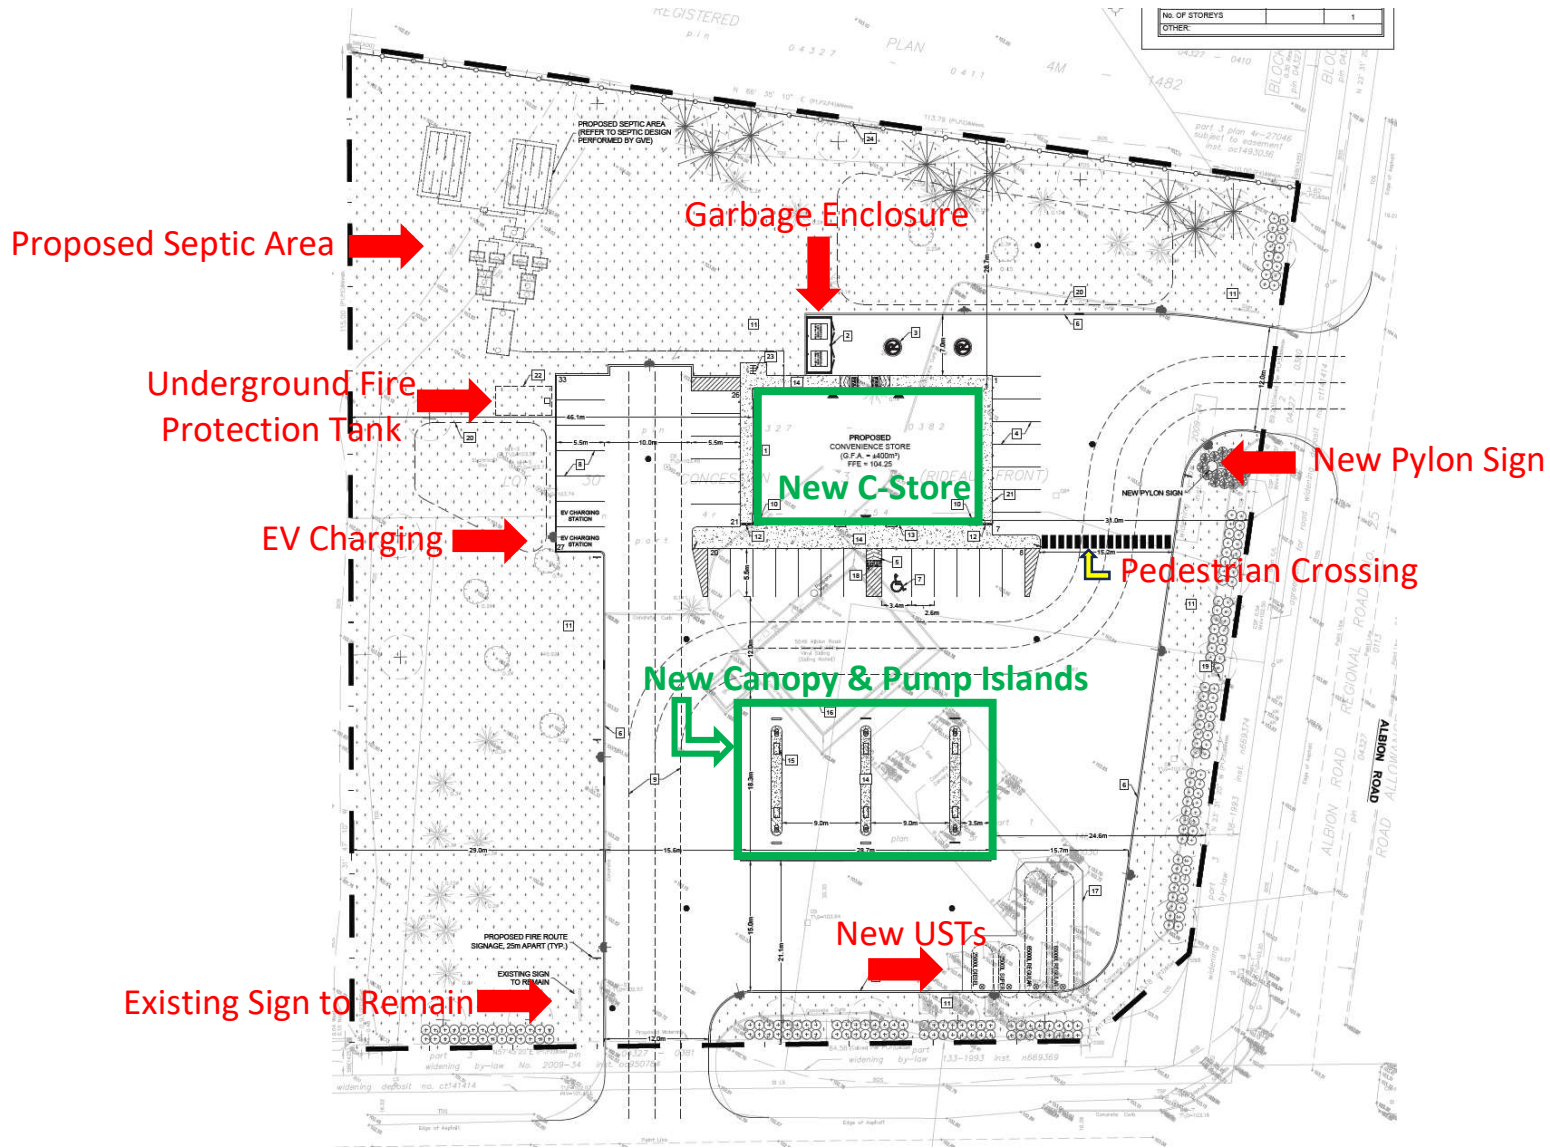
Exhibit L: Excerpt from Site Development Plan highlighting main features of Proposed Development
